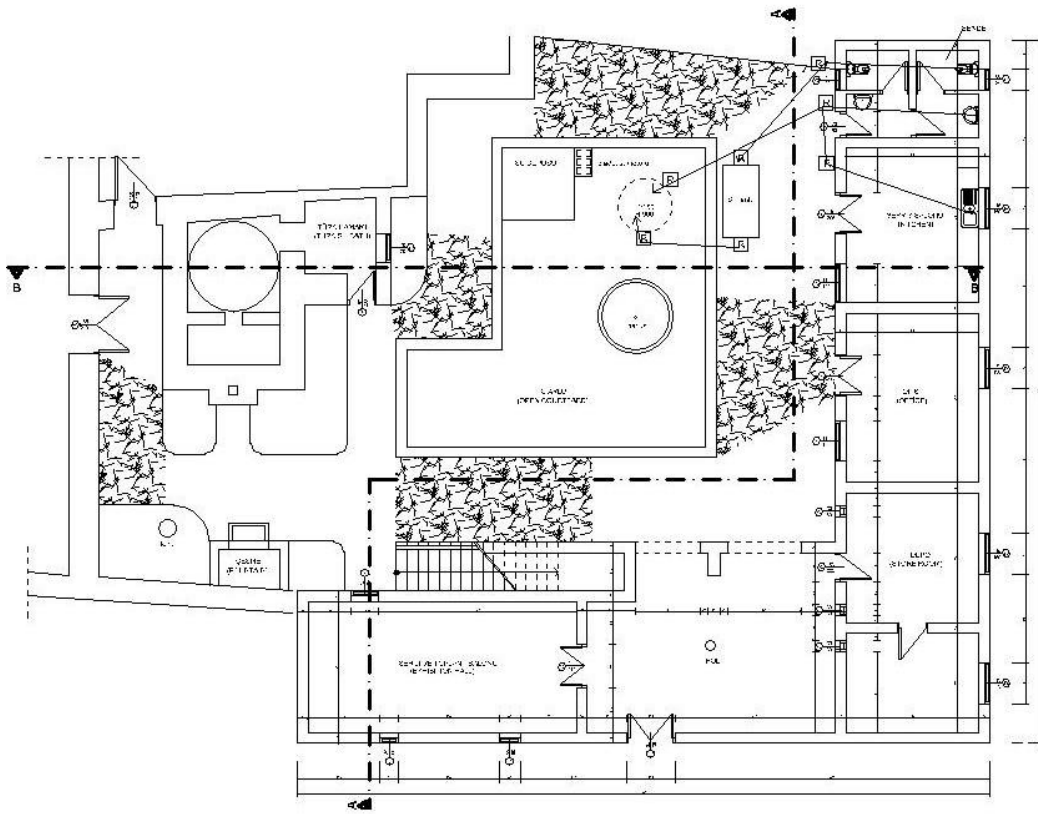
Ground floor plan of the female part of the Chimney House (Department of Antiques and Museums)
